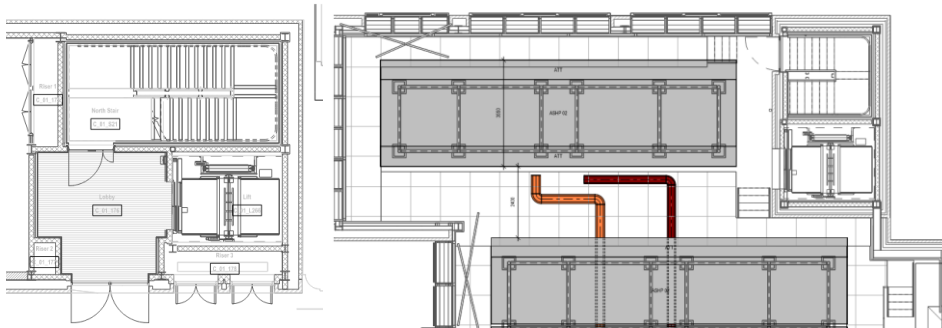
&2. North core stair and lift access (Ground floor) (left), North core stair and lift access (roof) (right)
